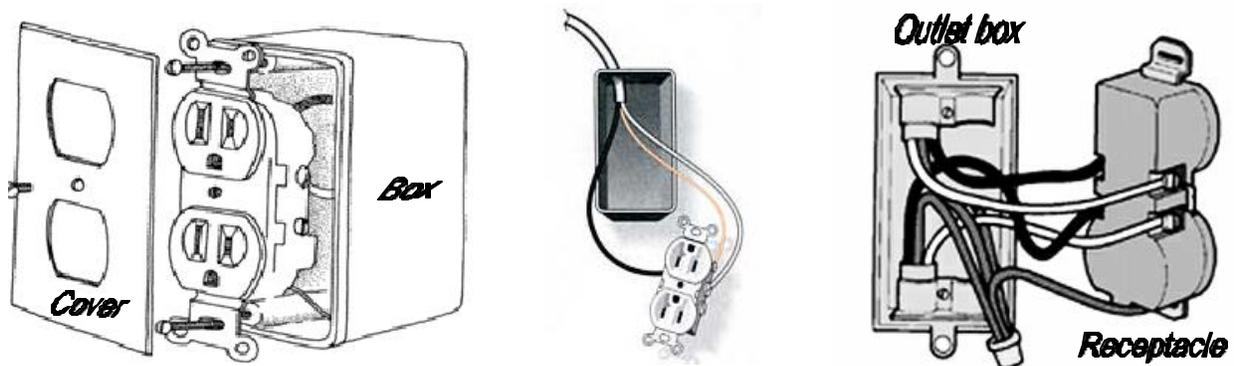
Outlet Boxes with Installed Grounded Receptacle
